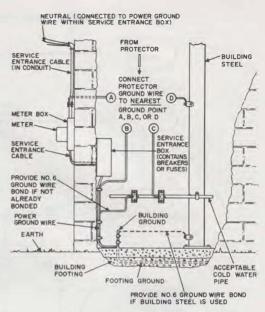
PAcceptable Water System or Building Ground (Power Service Grounded to Footing Ground)
